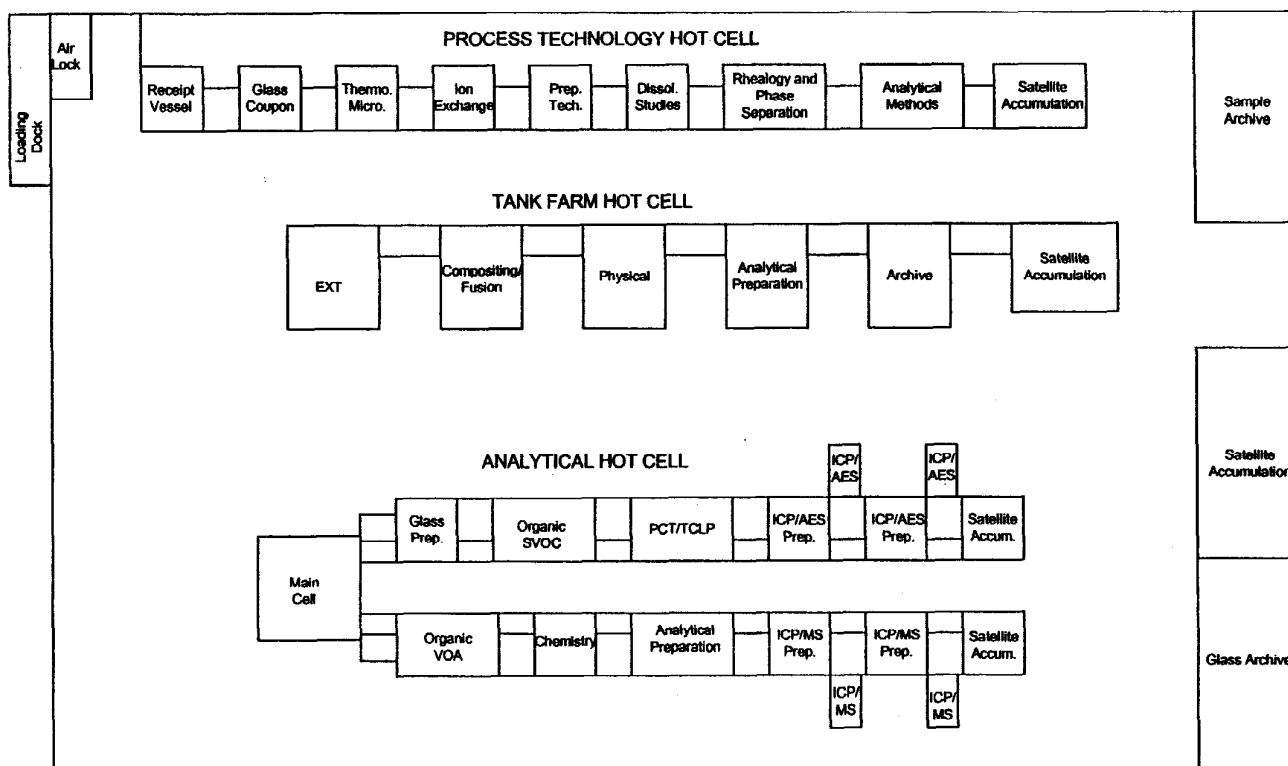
A-108 Analytical Laboratory Second Floor General Arrangement
